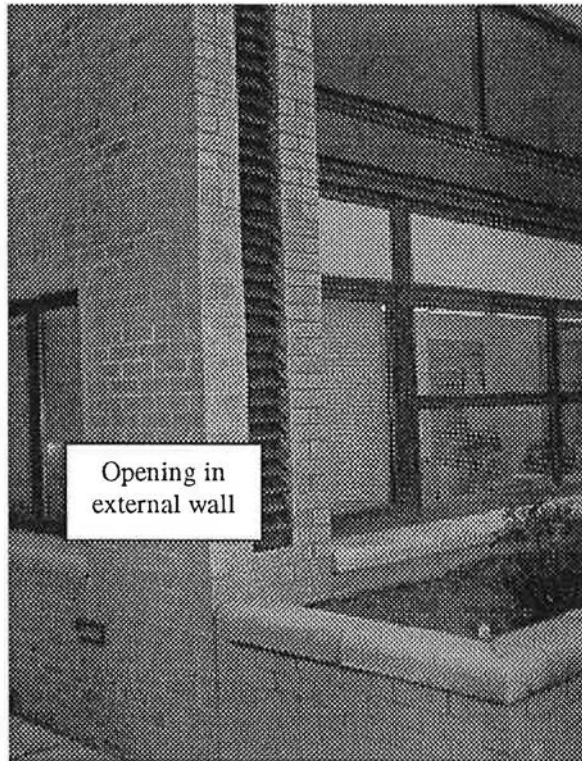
Air Inlet Openings on Walls Facing the Courtyard.
